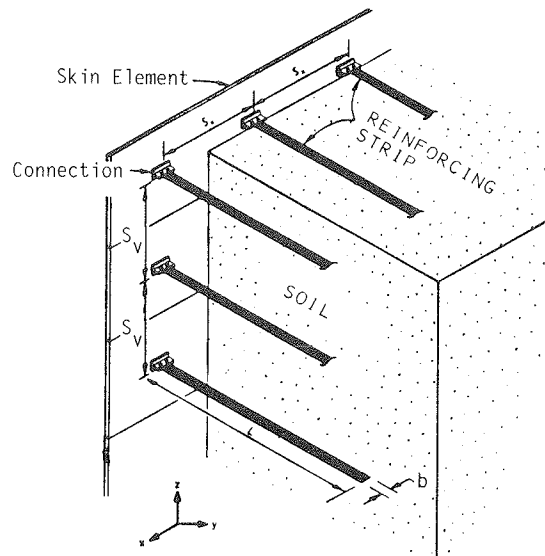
Schematic of major elements of nonmetallic strip reinforced soil wall.
